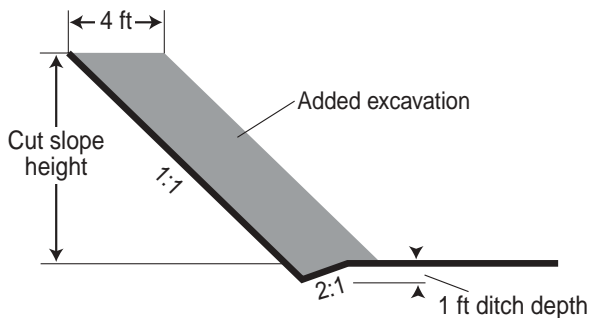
Added excavation of a ditched road as compared to an outsloped road.
